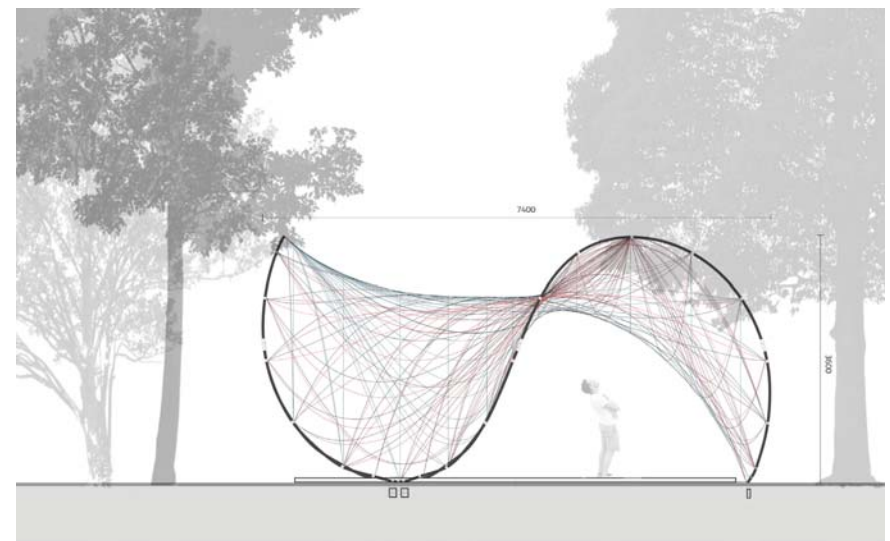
\_4: Architectural drawing. East elevation. (Source: Jingcheng Chen, Olga Kalina )
